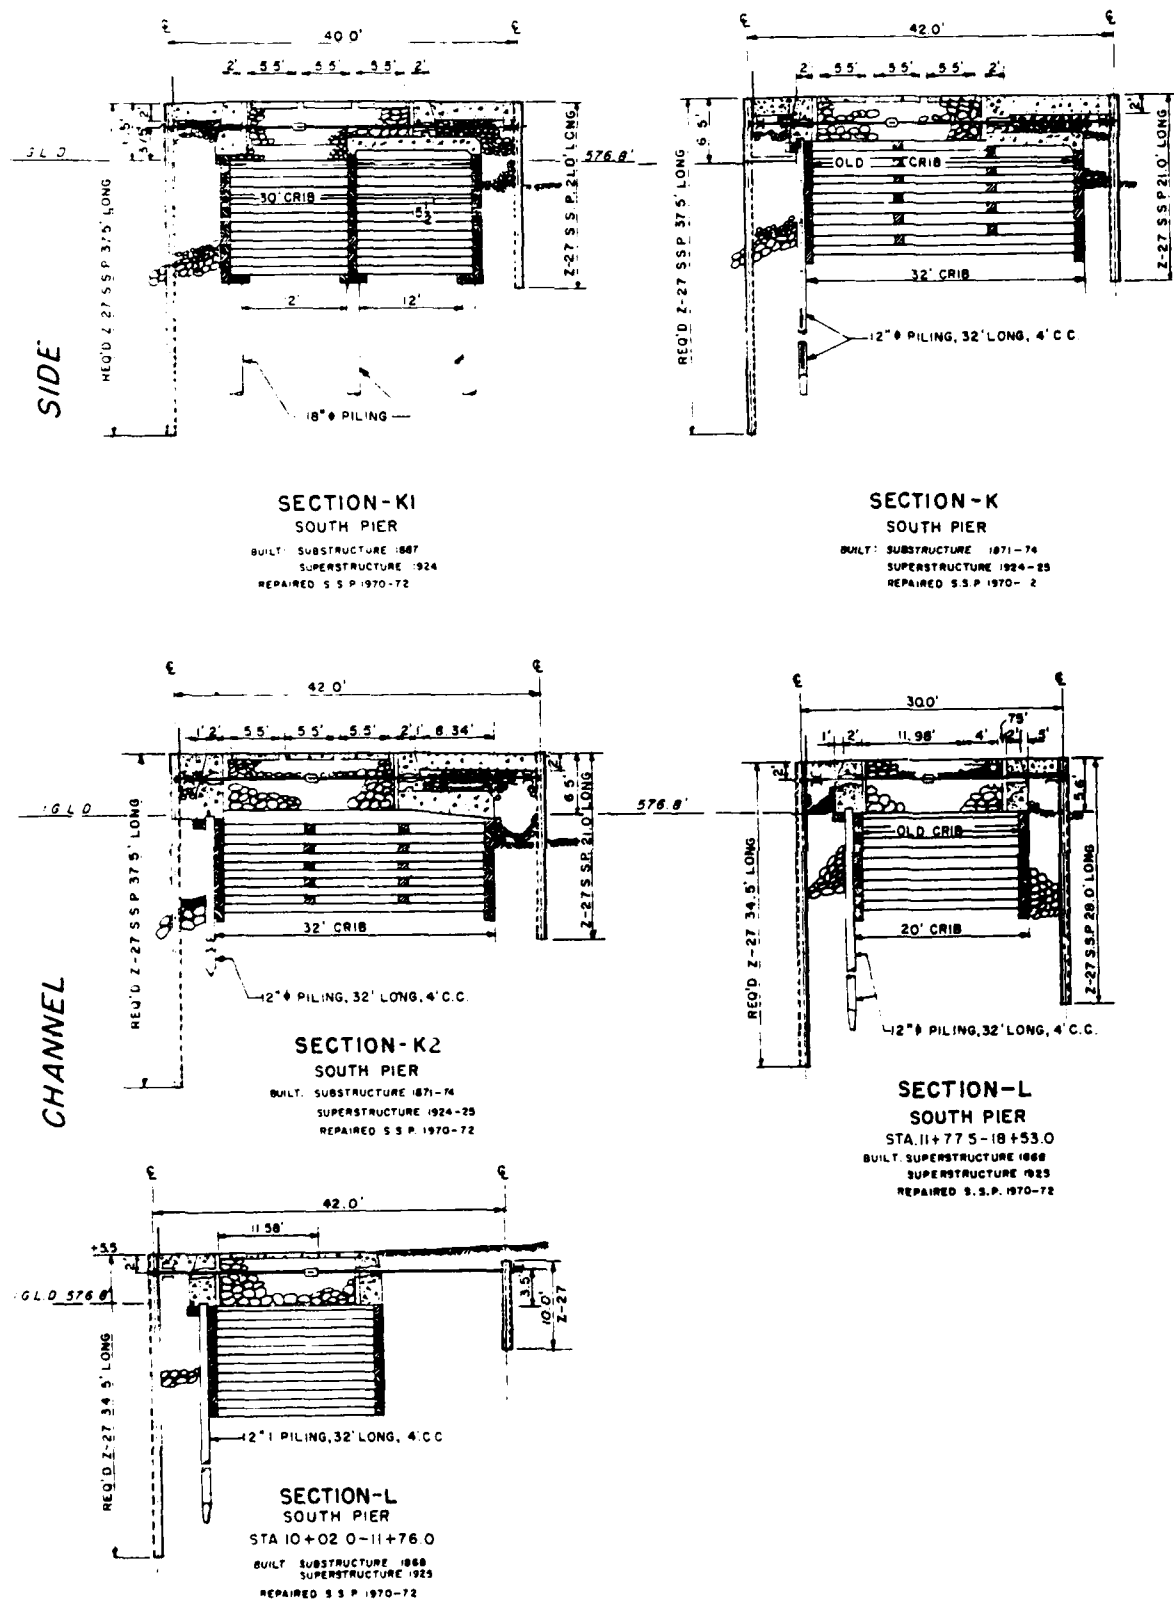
Typical pier cross sections, South Haven Harbor, Michigan
